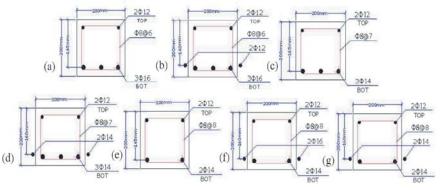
Cross sections of tested beams, a) beam A, b) beams A₁, A₂ and A₃, c) beam B, d) beams B₁, B₂ and B₃, e) beam C, f) beams C₁ and C₃ and g) beam C₂.
